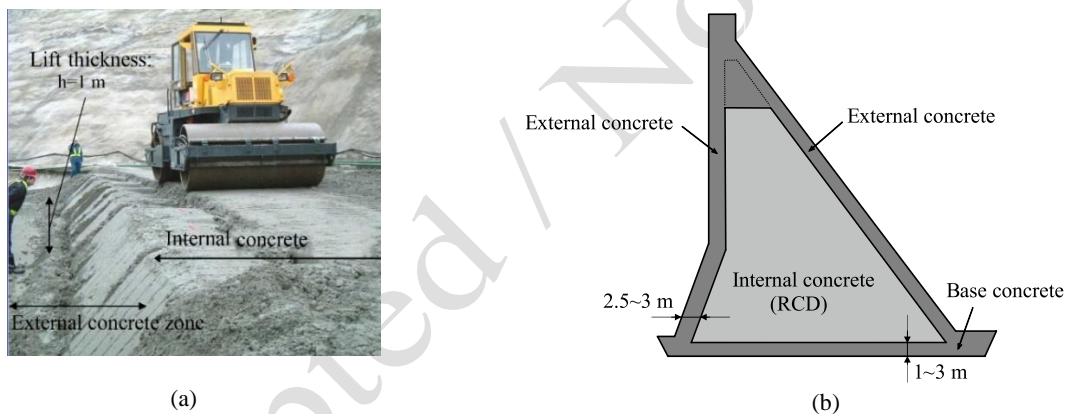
Details of RCD dam construction (Nagataki et al., 2008); (a) Internal concrete placement; (b) Internal and external concretes in the RCD dam body.
